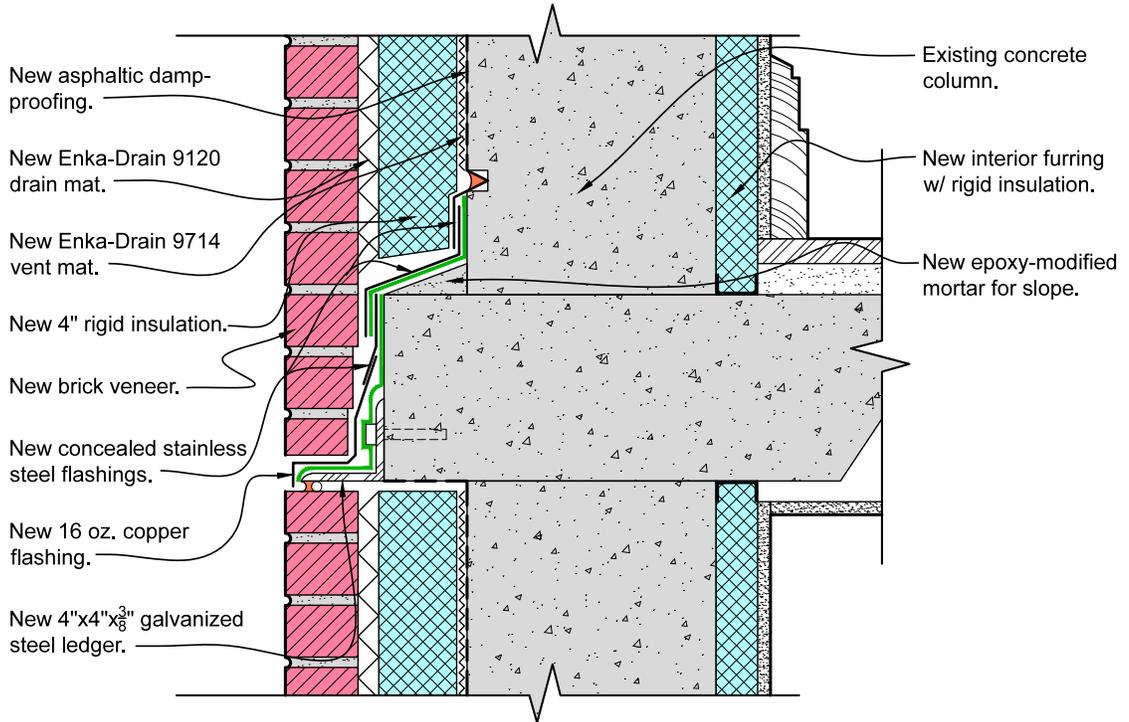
(1): Typ. New Brick Veneer Over Exist. Concrete Column- Opt. 2 & 3
